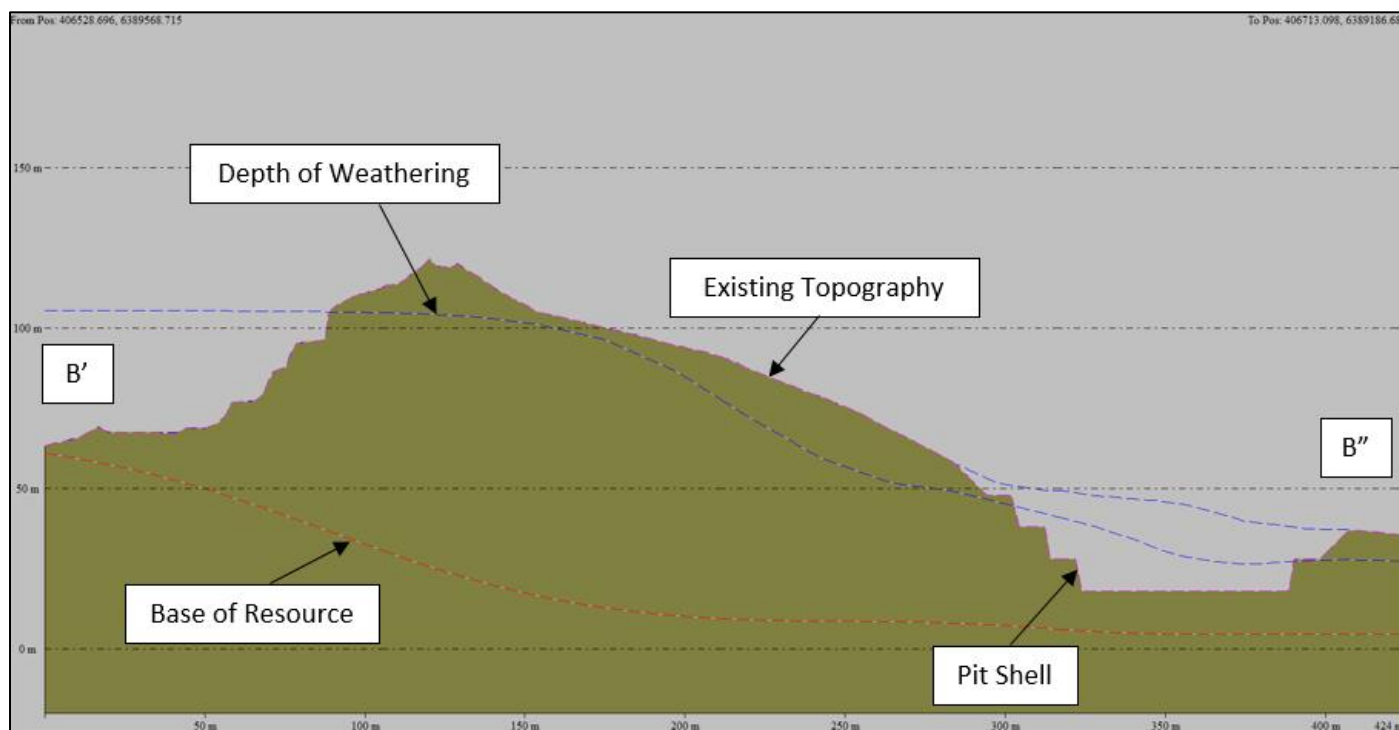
CROSS SECTION B'-B'' – STAGE 1B
